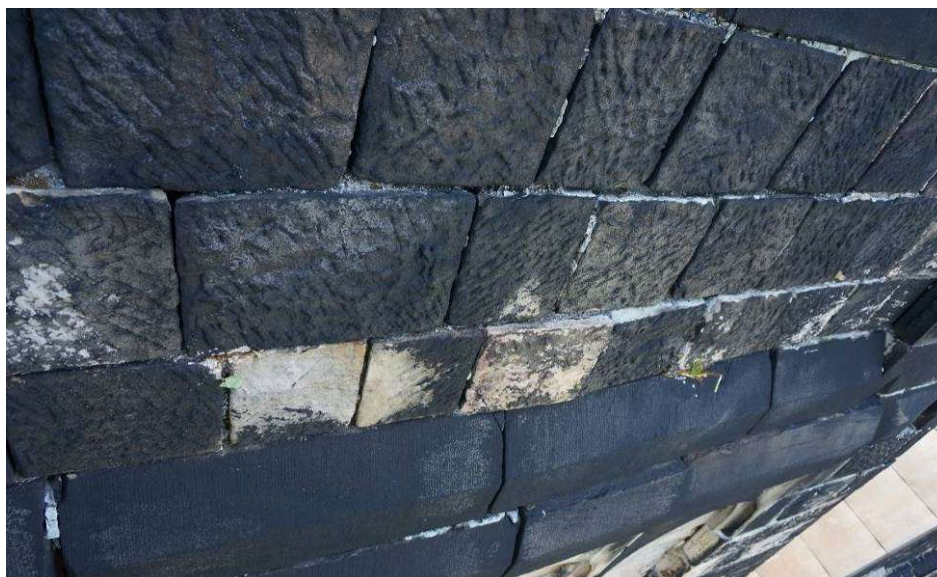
North tower. Loss in joints, cracks in stone works, bumps in masonry units and the cornice
